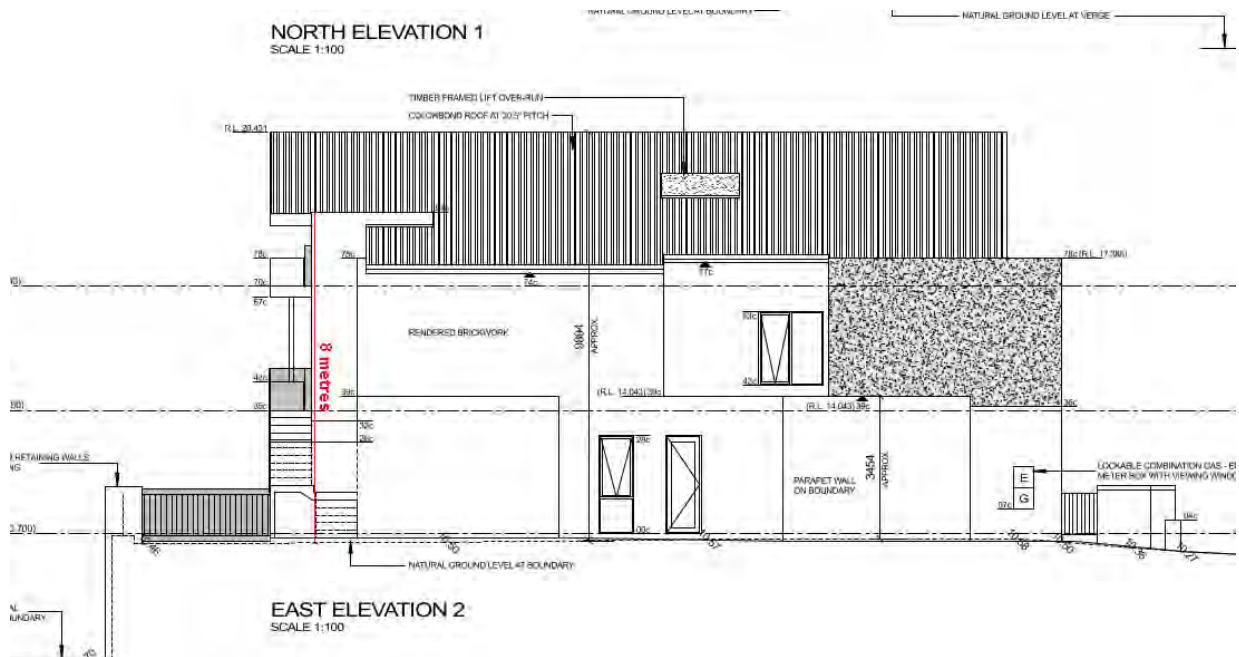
East elevation of 39 Mathieson Avenue, depicting 8m external wall height
